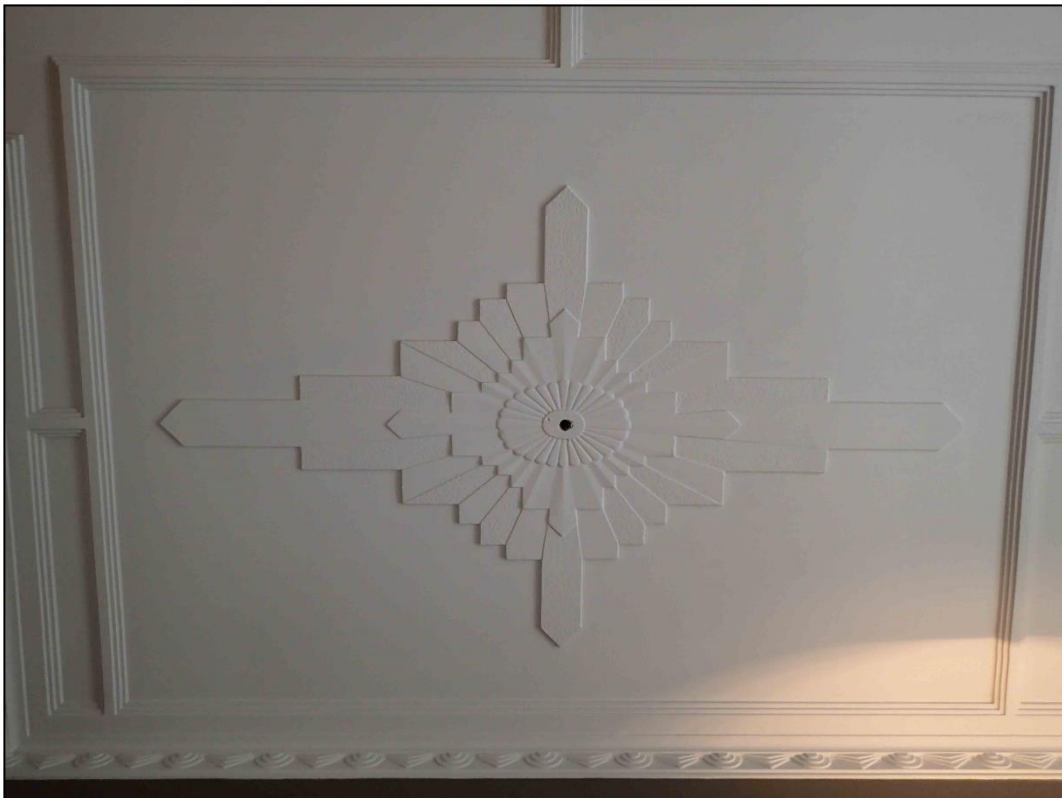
Detail of ceiling moulding and cornice on first floor of 18 Kelvin Street.
